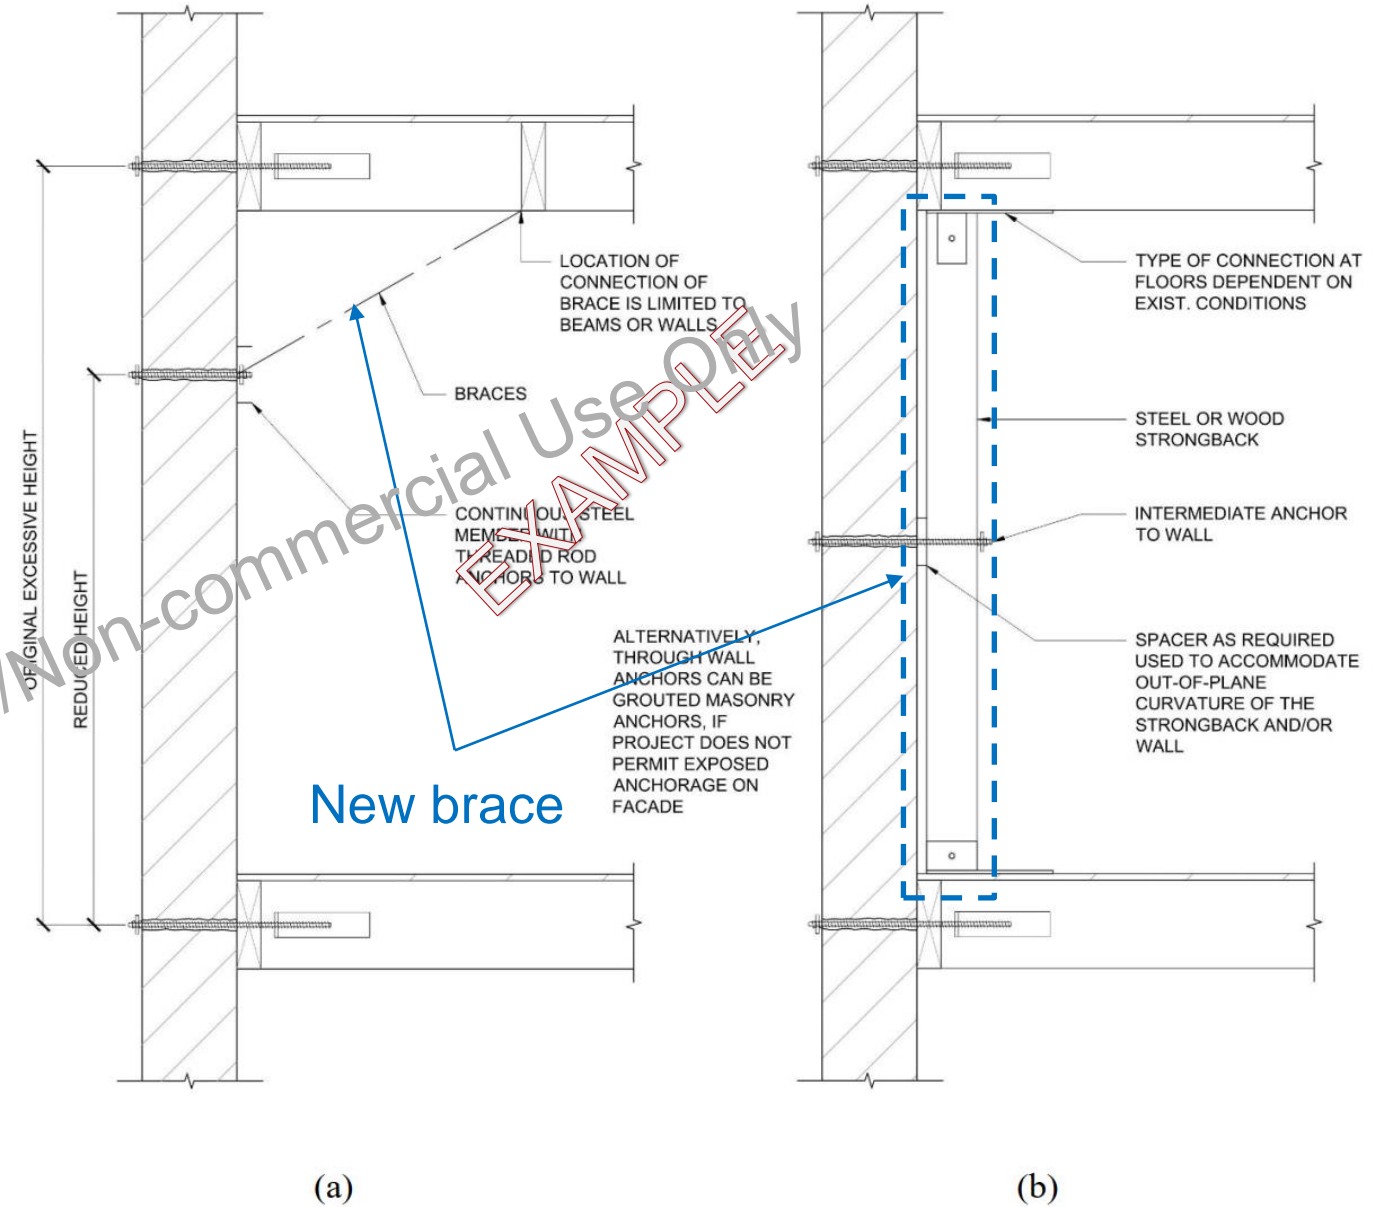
Addition of diagonal (a) and vertical (b) out-of-plane bracing to existing URM wall
